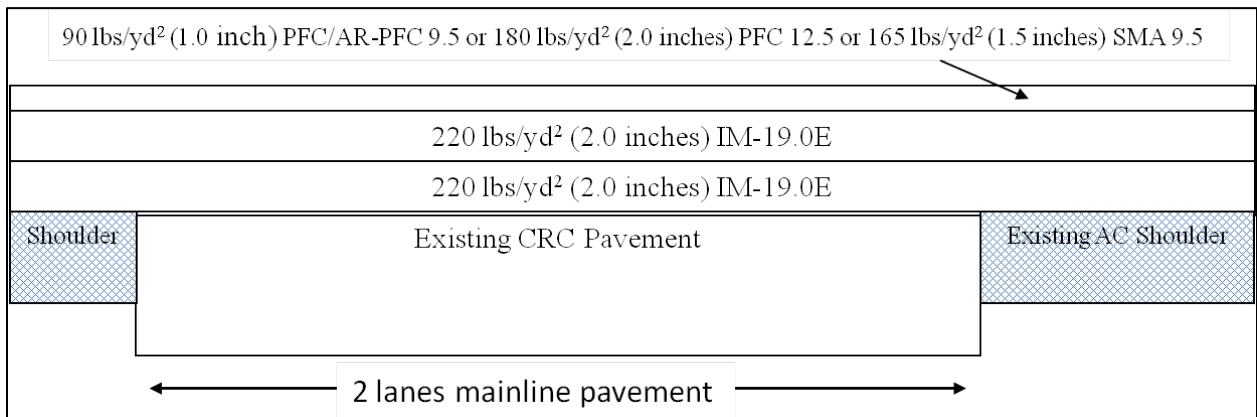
Cross-section of pavement structure with a Continuously Reinforced Concrete (CRC) Base: QP Demonstration Project 3.
